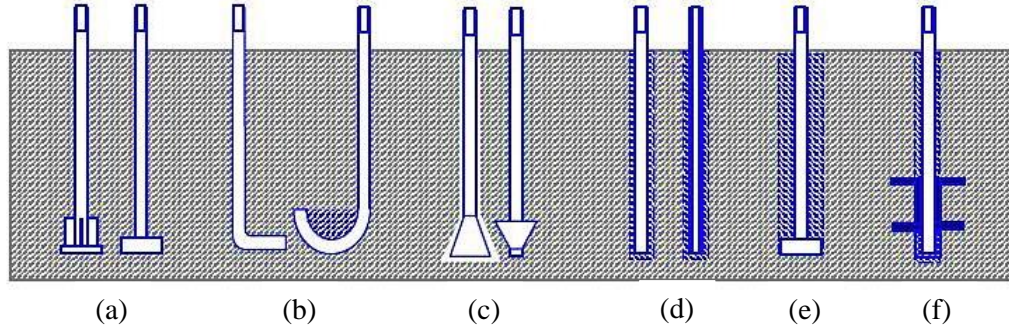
Different types of anchor bolts including: a) cast-in-situ headed anchor bolts, b) hooked bars, c) undercut anchor bolts, d) bonded anchor bolts, e) grouted anchor bolts, f) anchoring to grillage beams (Moore and Wald, 2003)
